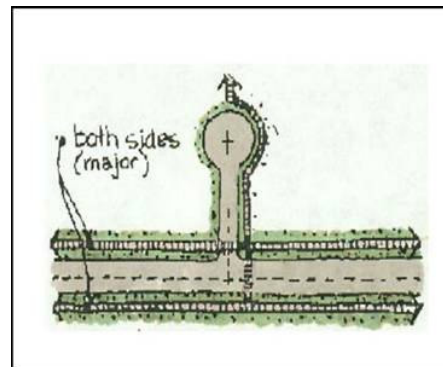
Plan view sketch of a cul-de-sac street.
